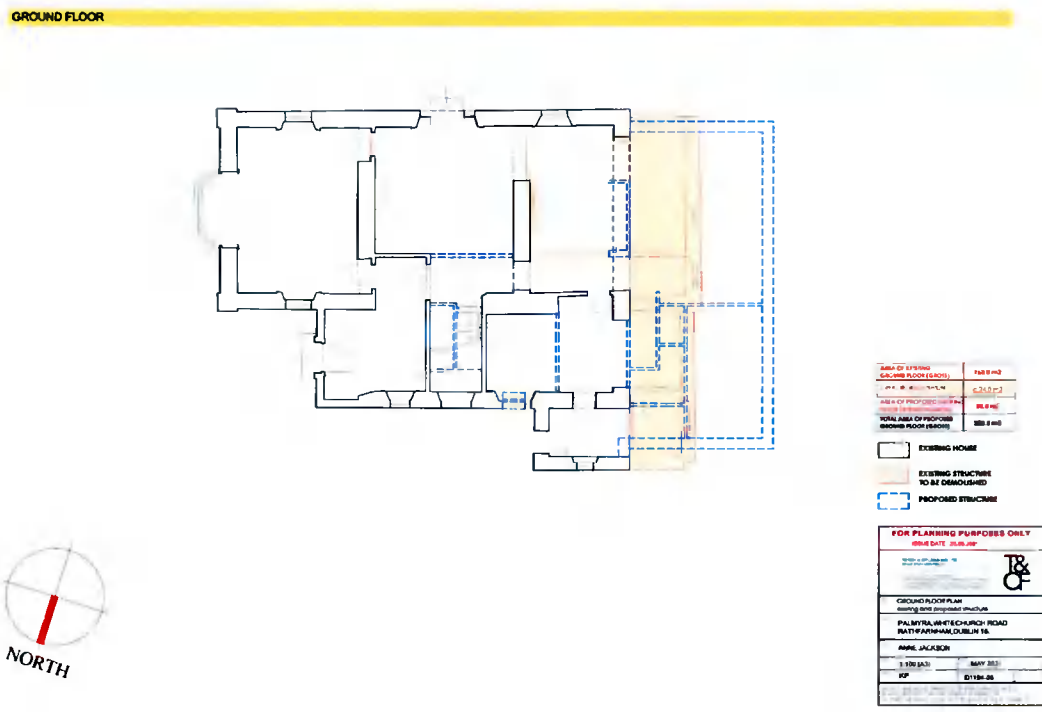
Ground Floor Plan. Showing proposed changes to existing fabric and new interventions. Not to Scale
